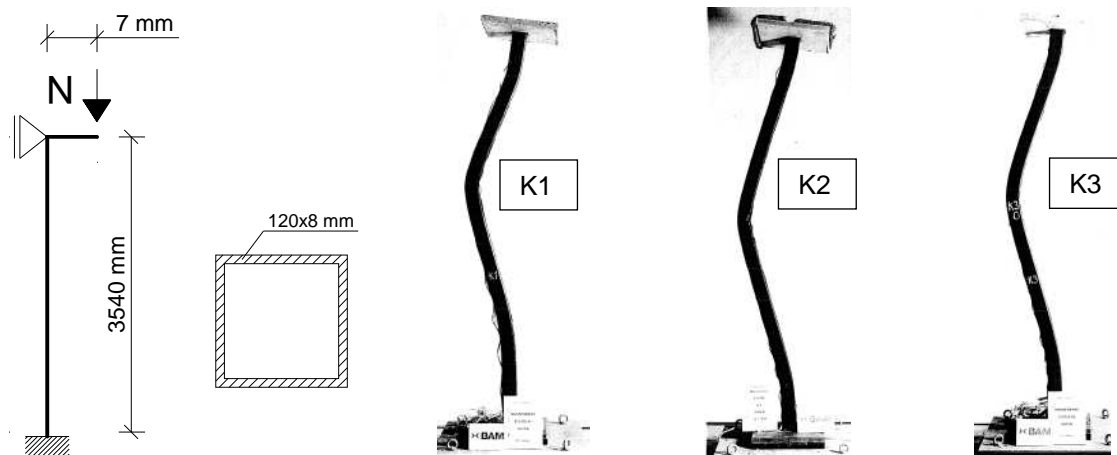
Static system and cross-section of the columns tested in Berlin (left); deformed columns K1 to K3 after test and cooling.
